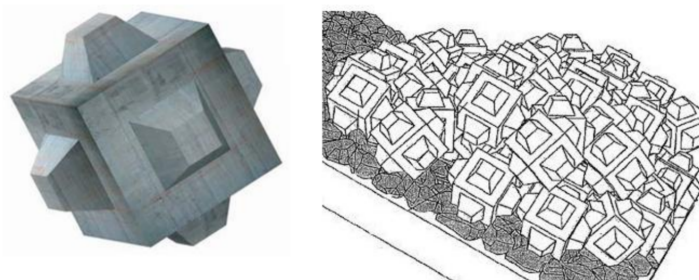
Impression of an artificial concrete cubipod element and layered placement
